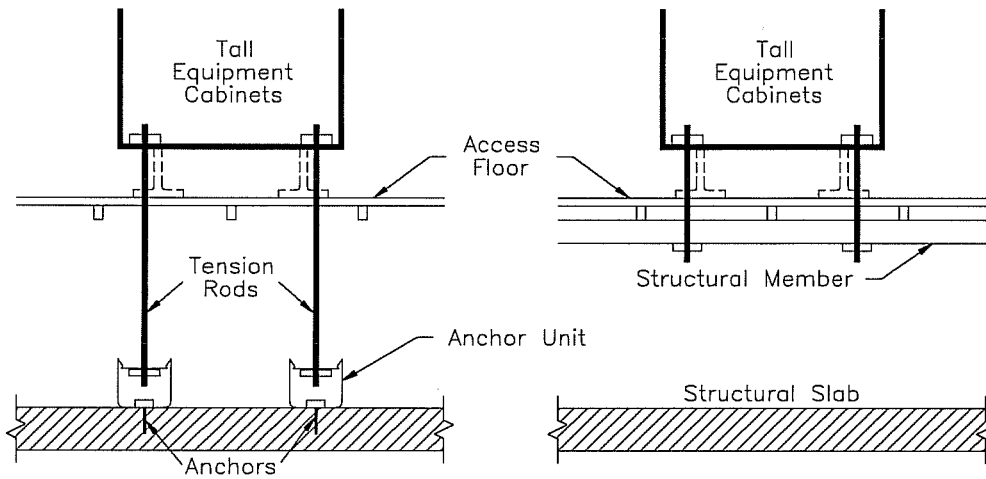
Computer Equipment Through Floor Anchorage (Ref. 11)
